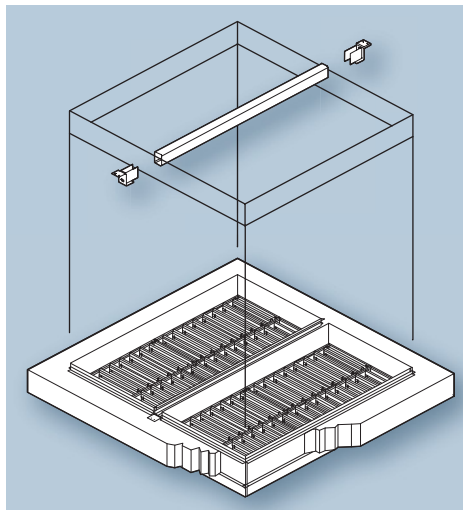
Horizontal mullion for dividing oversized opening in concrete floor.
